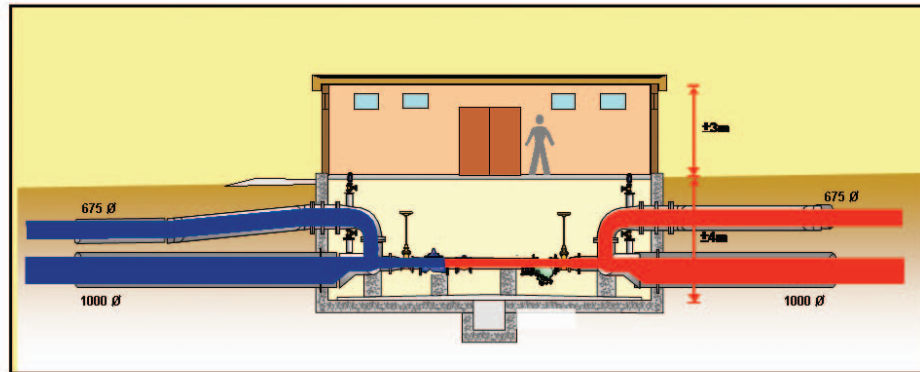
Elevation layout of the Sebokeng/Evaton installation
